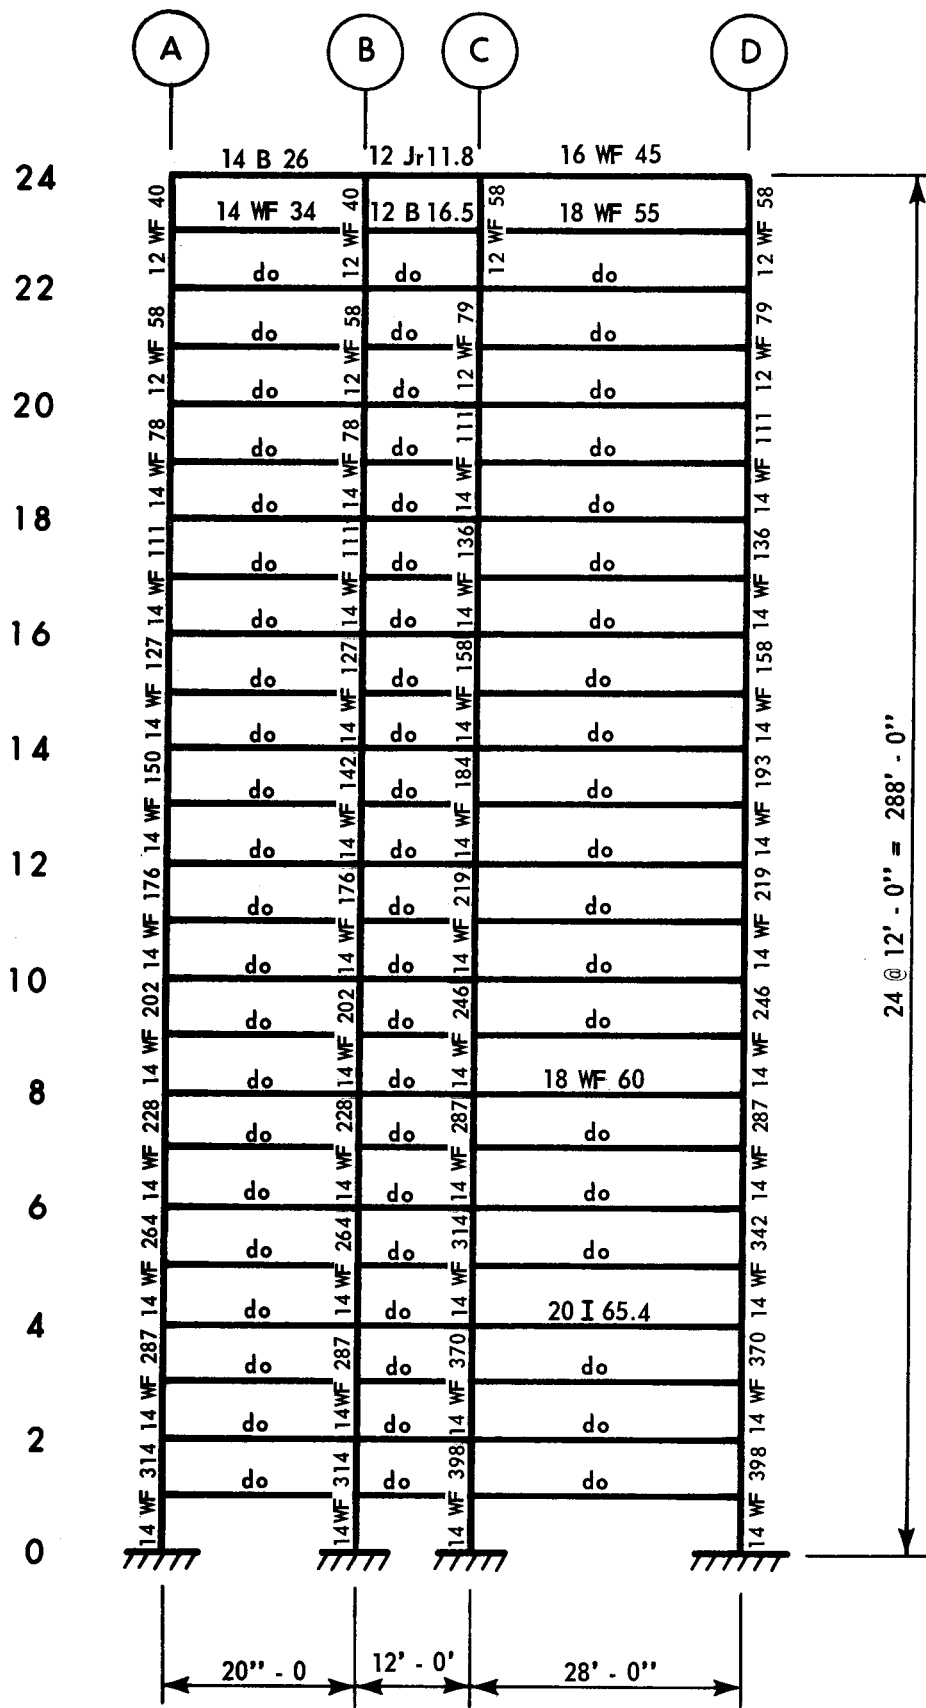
ELEVATION TWENTY-FOUR STORY STRUCTURE L
